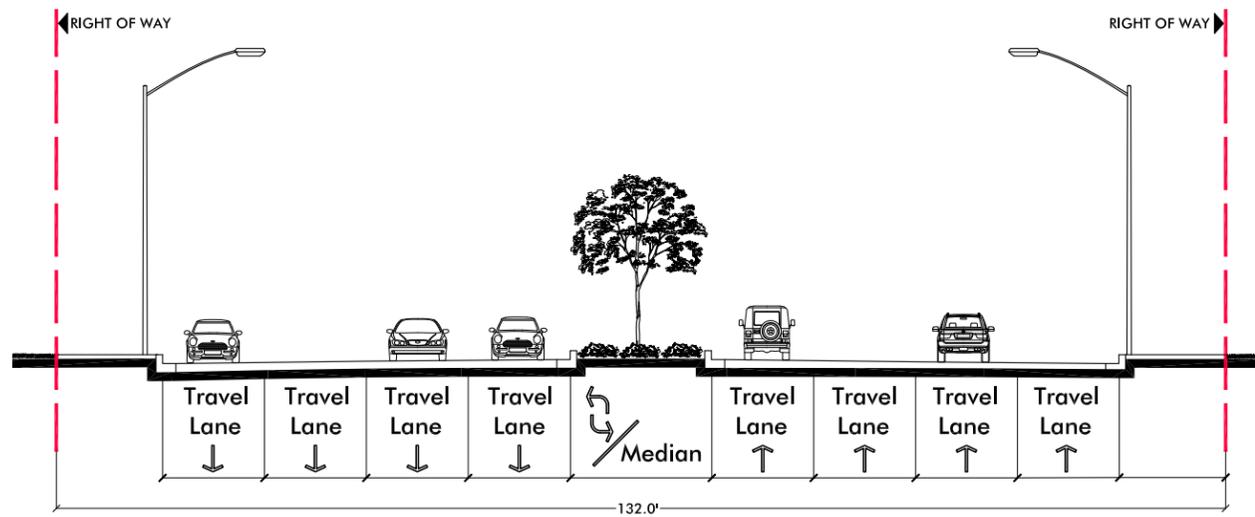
BEACH BOULEVARD EXISTING STREET DESIGN - NORTH OF ADAMS
